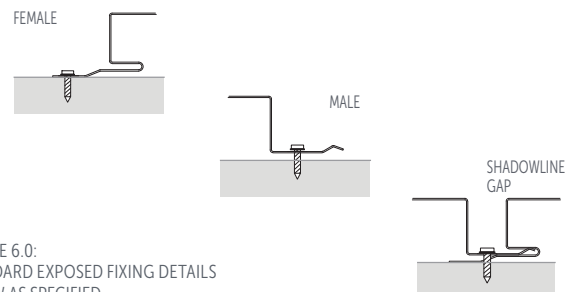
STANDARD EXPOSED FIXING DETAILS SCREW AS SPECIFIED
